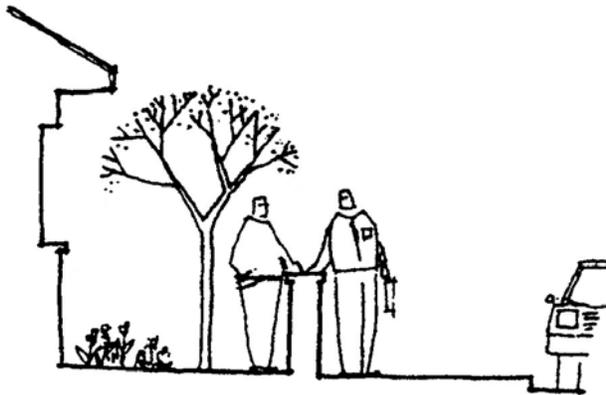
Where a setback from the sidewalk is small, raising the floor level up more than 4' above the sidewalks and/or providing a planting bed can provide a sufficient transition.
